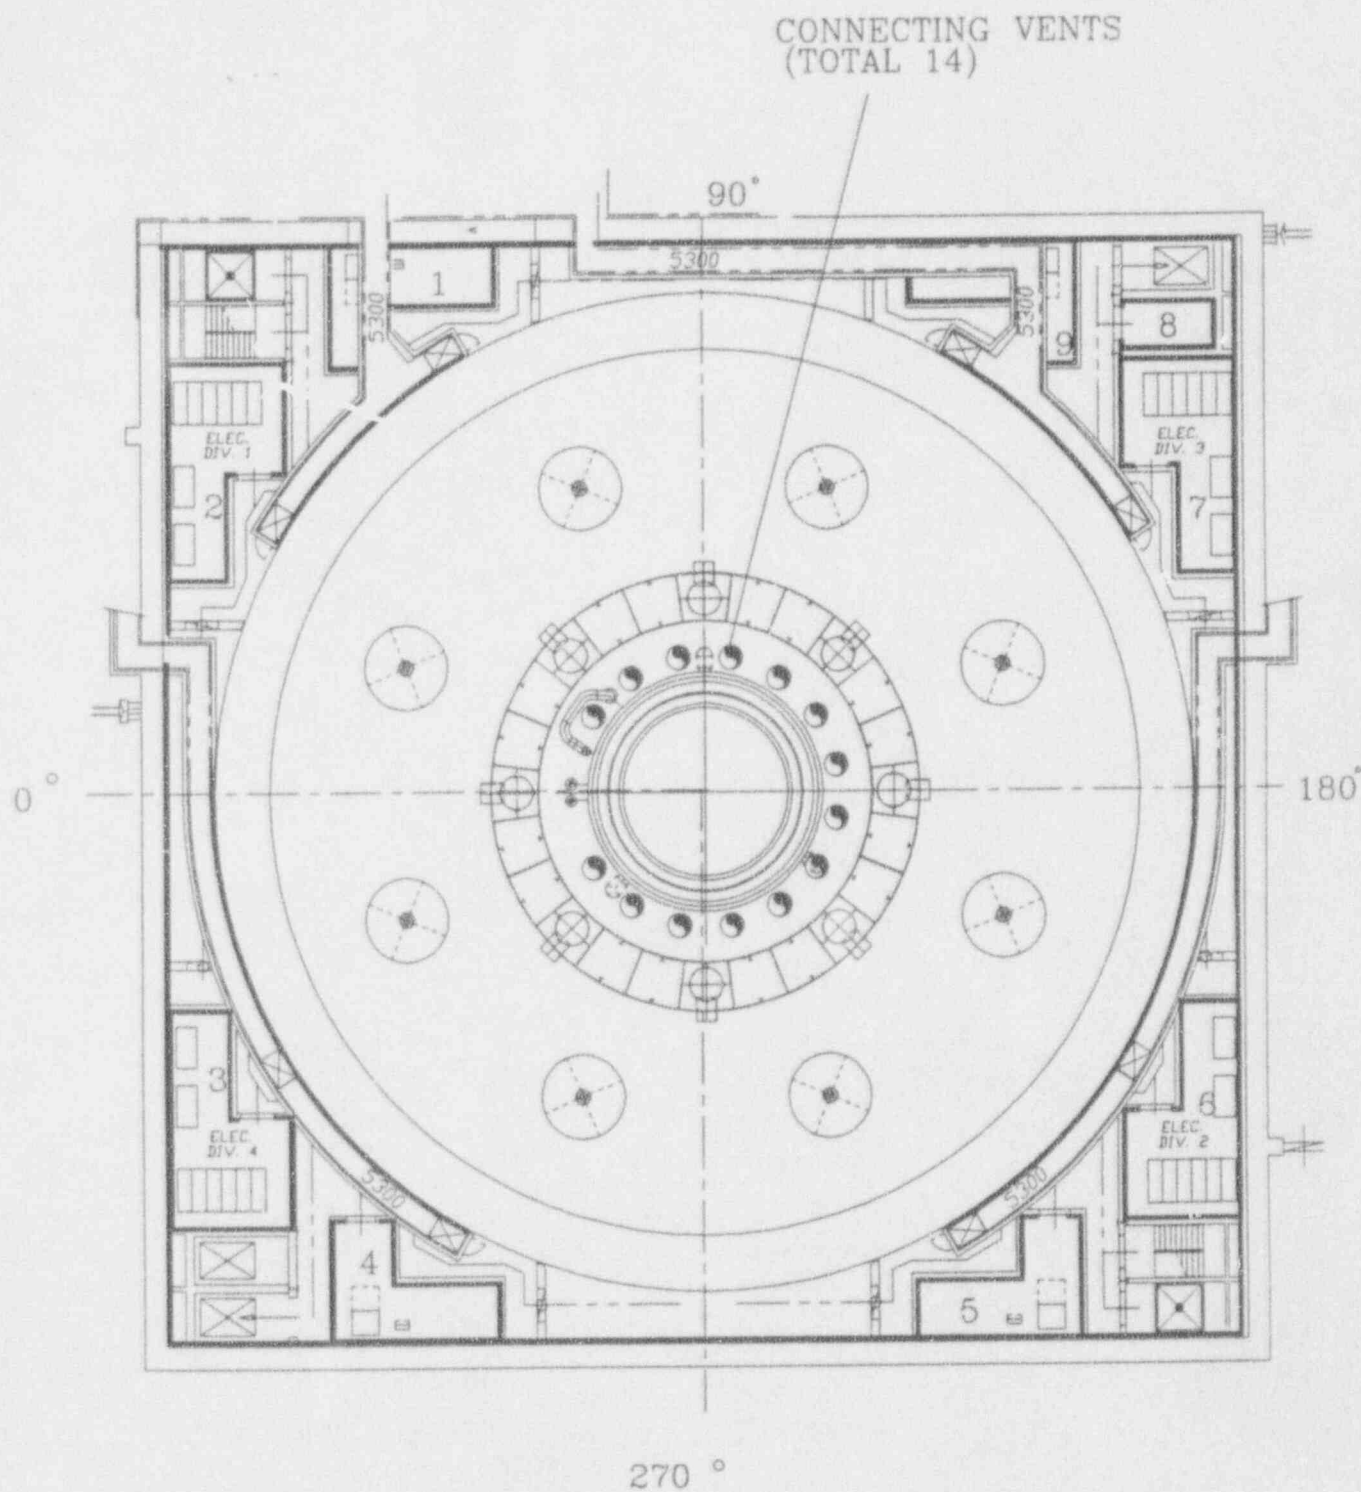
SAFETY ENVELOPE FLOOR ELEVATION 3050
